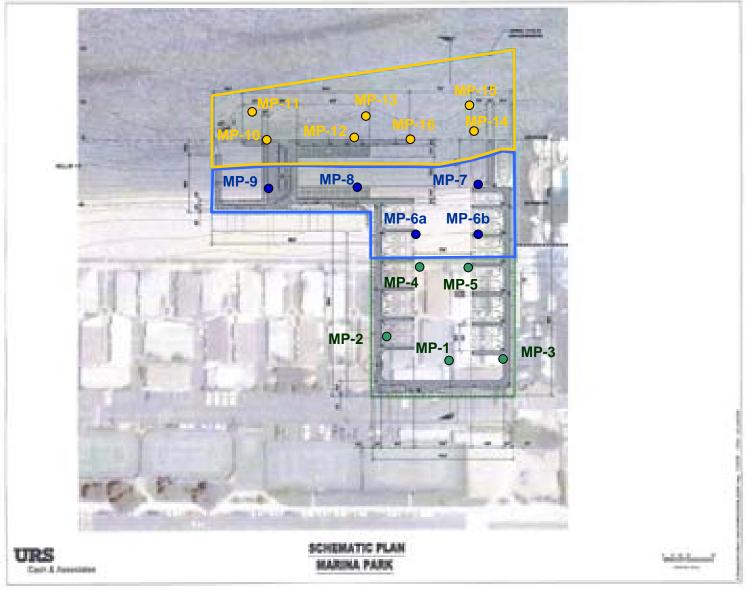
Project Areas and Station Locations with Proposed Project Plan and Current Bathymetry
